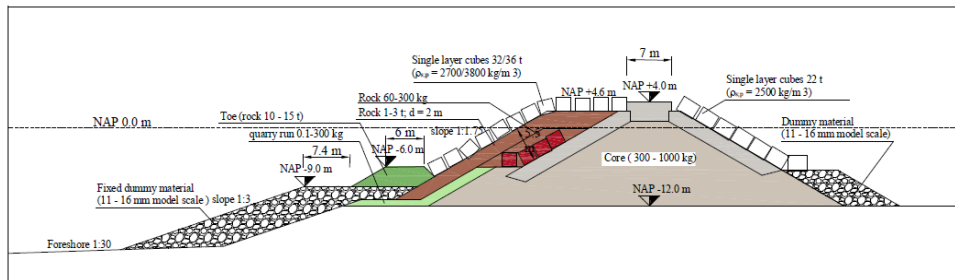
A cross-section of the overlay construction with single layer of concrete blocks (Dorst 2006).
